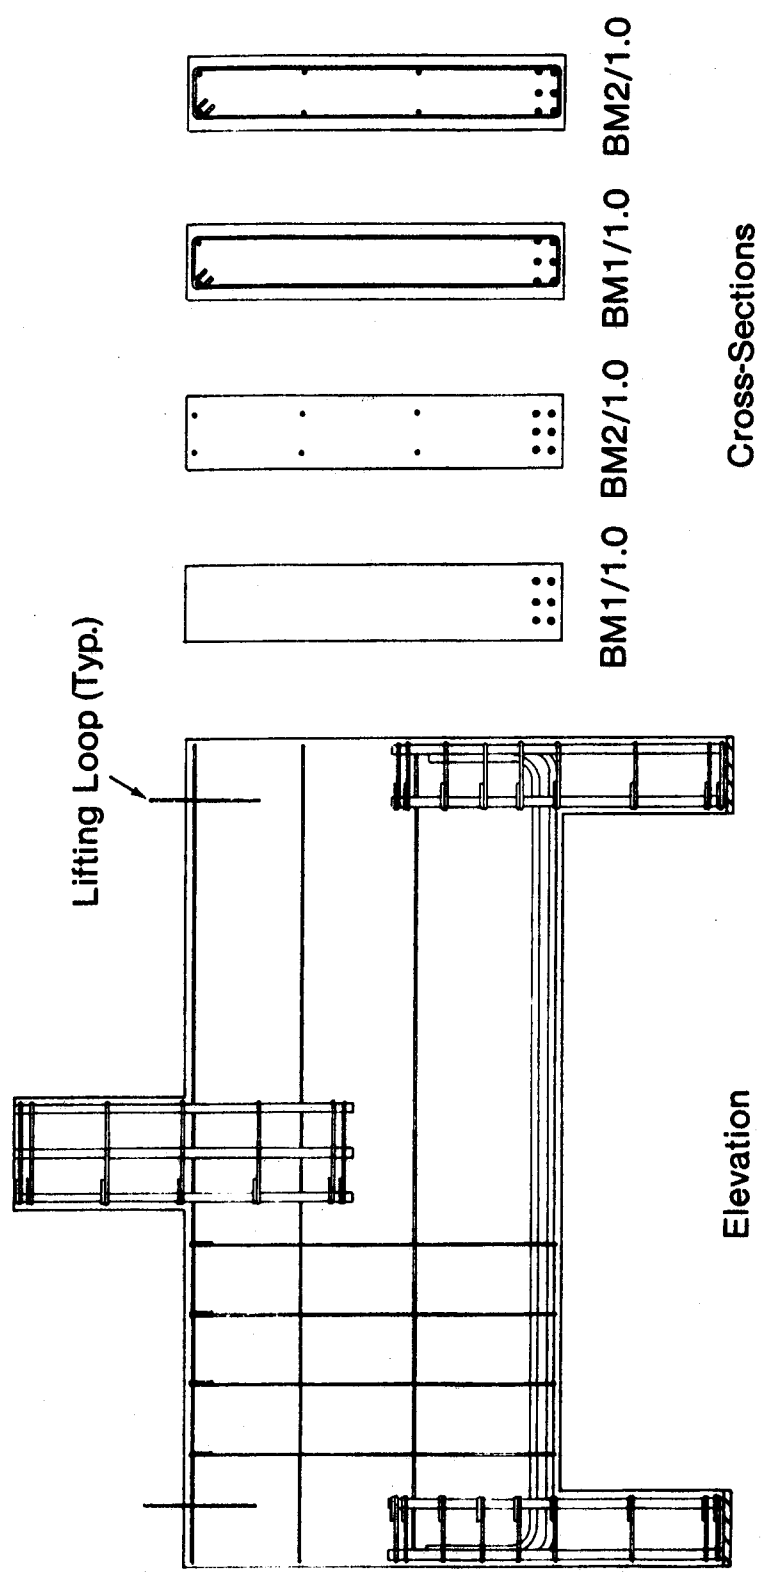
Beam 1/1.0 and 2/1.0 Reinforcement Details.
